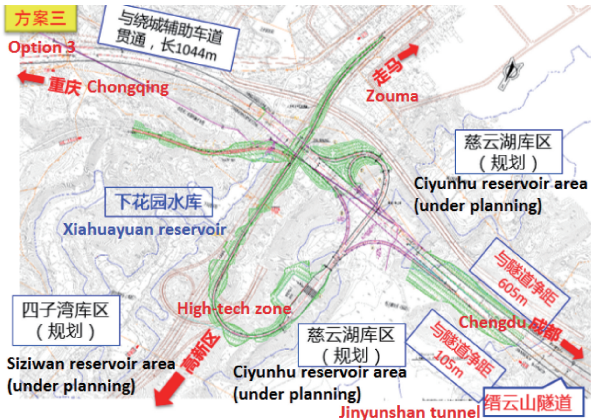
The floor plan of the K-line Zouma Interchange (Option 3)
